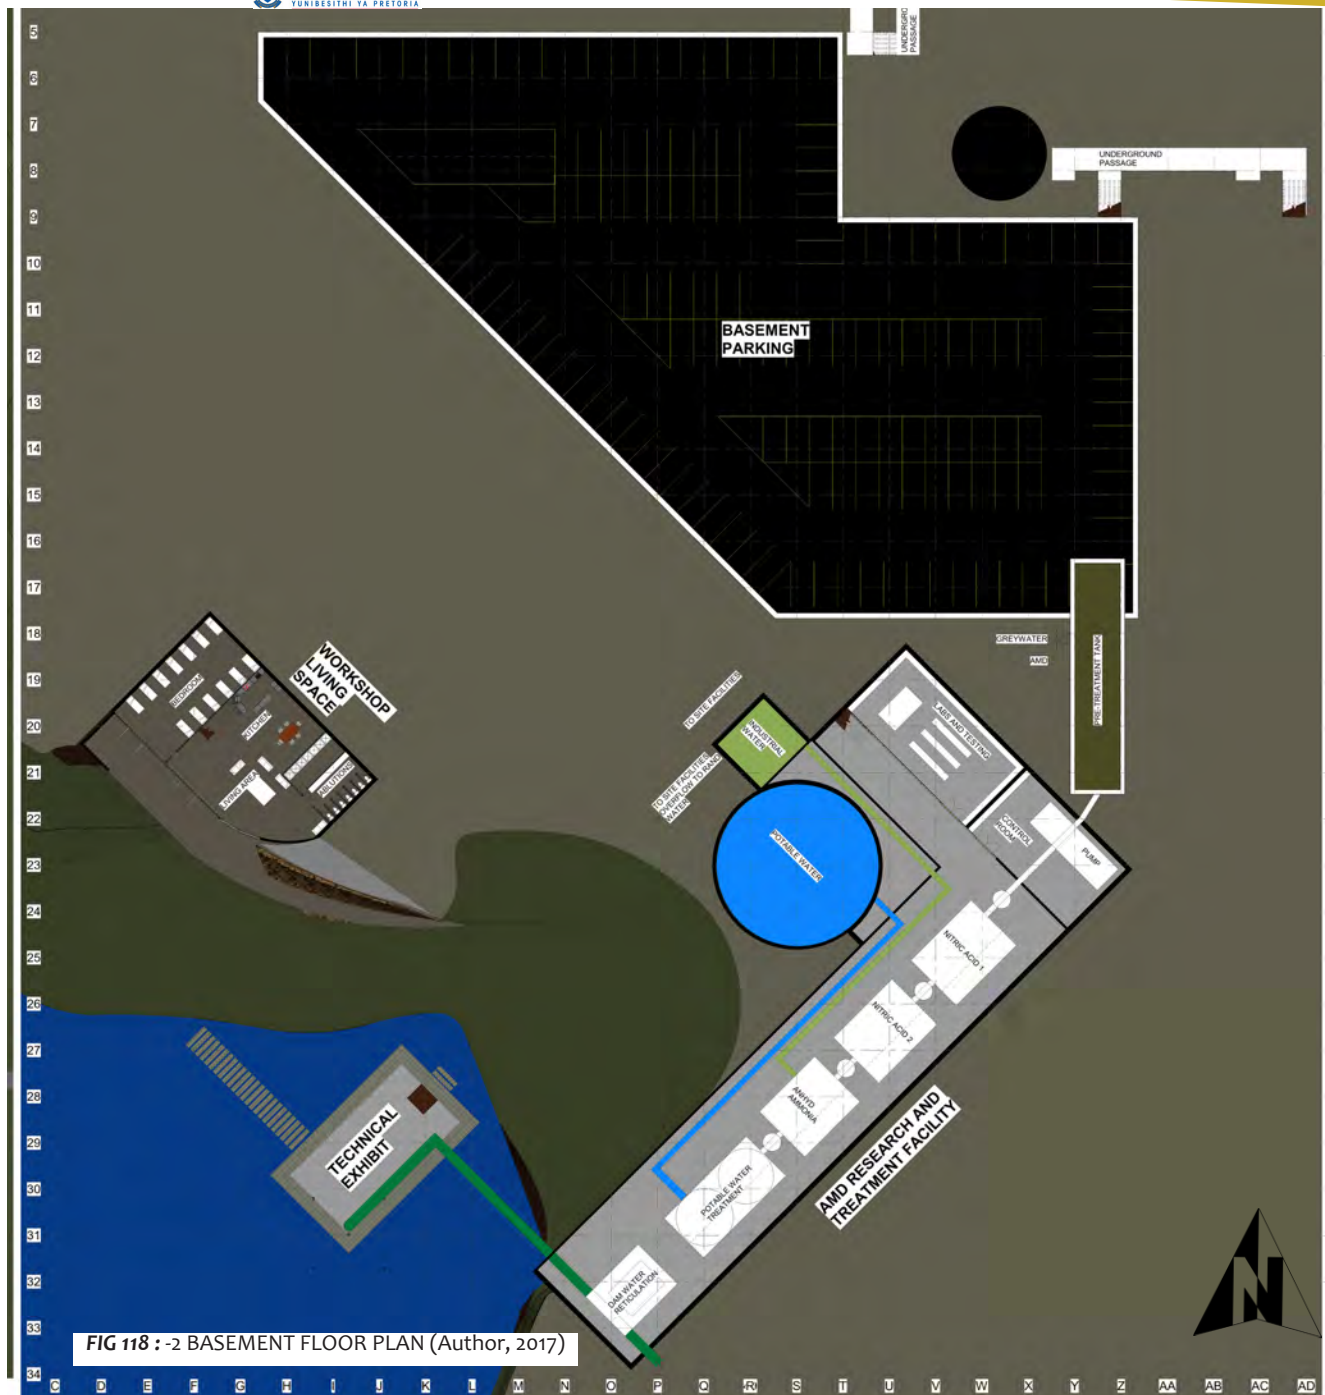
2 BASEMENT FLOOR PLAN (Author, 2017)
